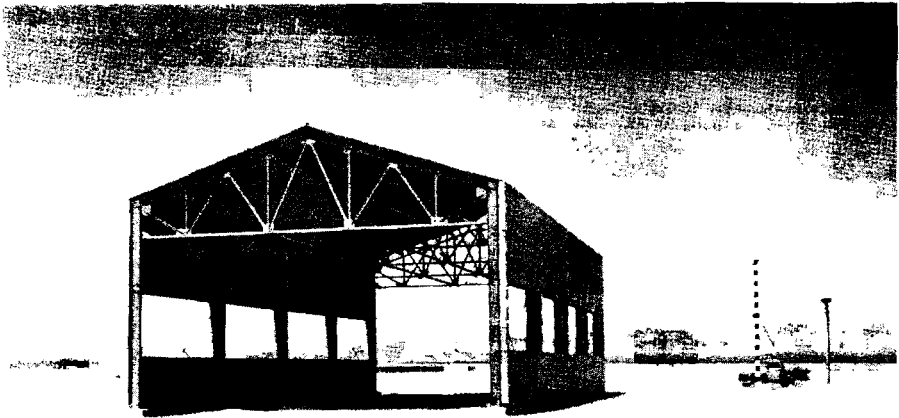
Steel-frame building with concrete siding and window openings of 30 percent of the wall area.
